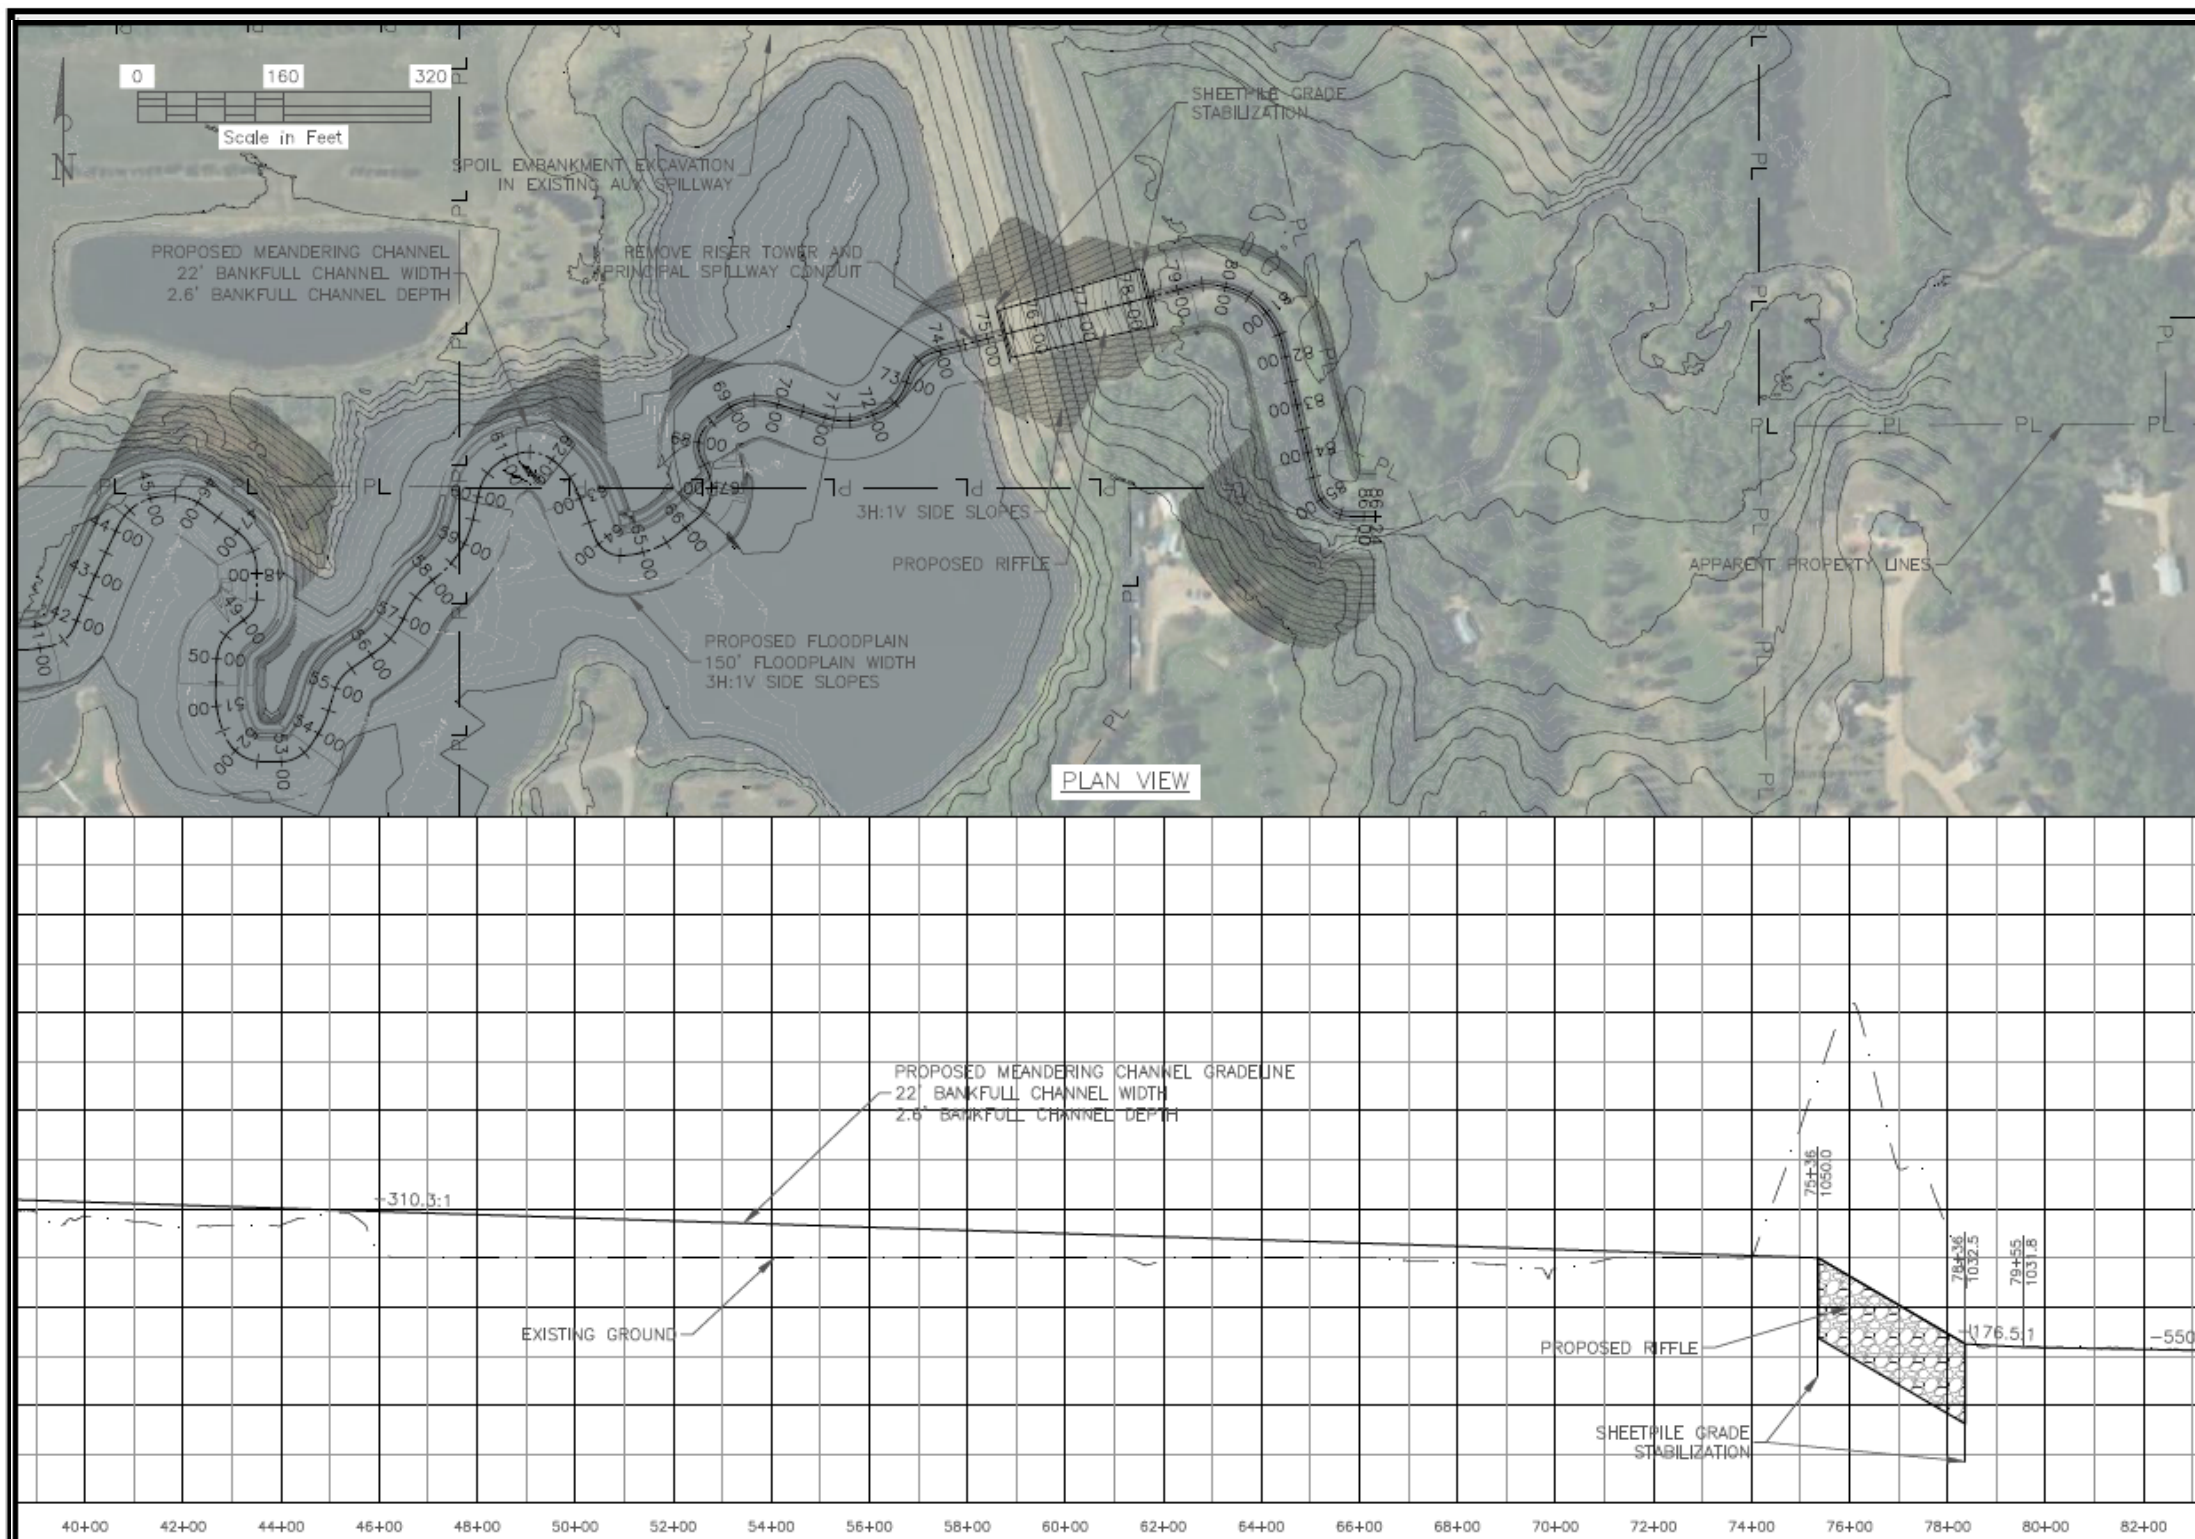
Non-Structural Decommissioning Plan and Profile (Lower)
